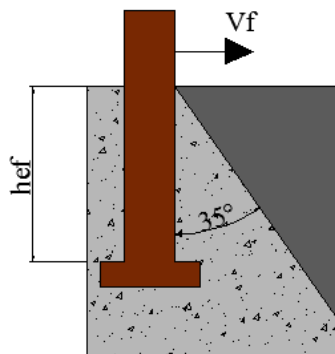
Embedded Anchor Theoretical Crack Propagation and Failure Plane
